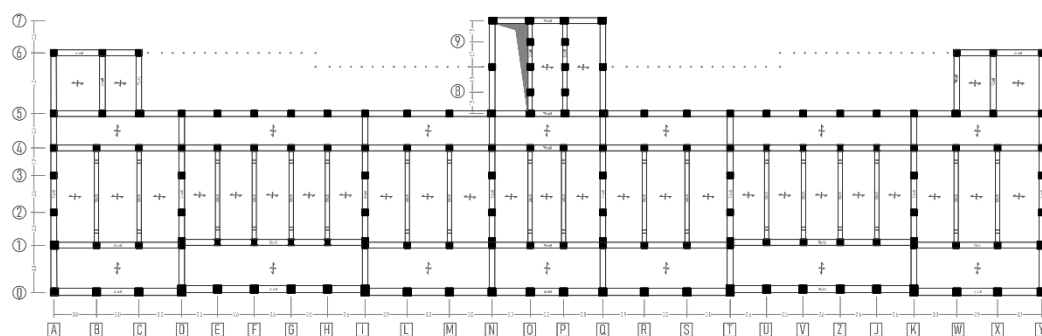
First deck carpentry of Pavilion A—© Silvia Trampetti.
